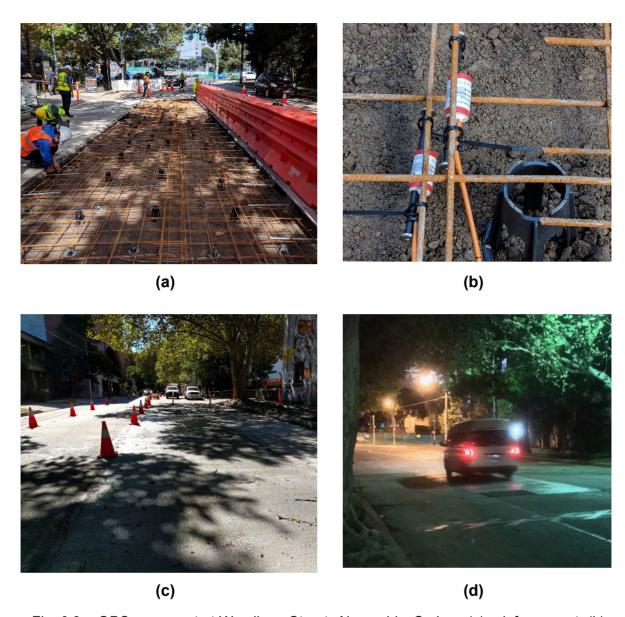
GPC pavement at Wyndham Street, Alexandria, Sydney (a) reinforcement, (b) vibration strain gauges, (c) GPC pavement just after casting and (d) the first traffic driving over GPC pavement at 5 am after 36 hours of casting.
